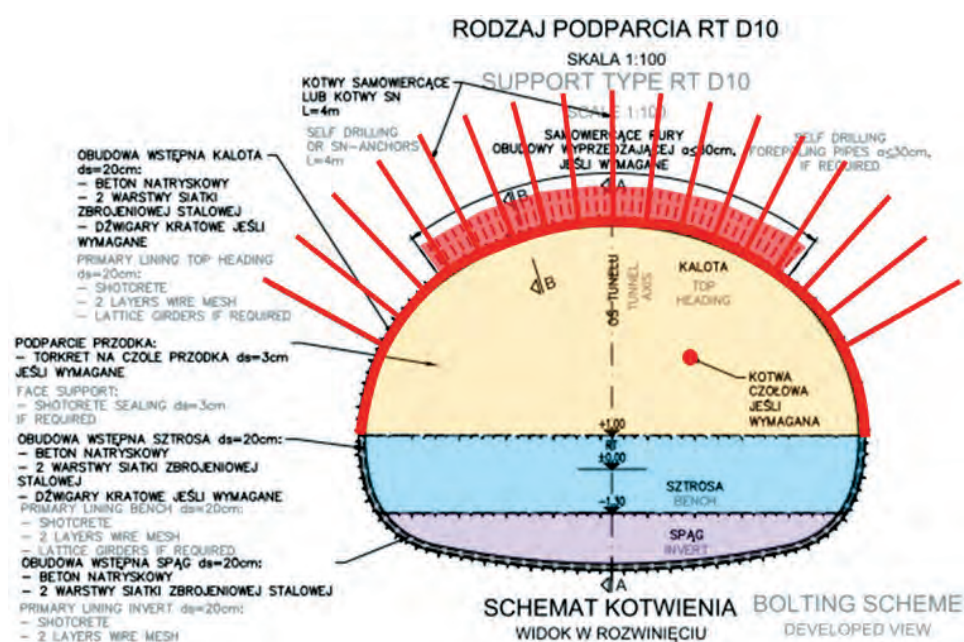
Support class D10, cross-section of pit division with elements of primary lining [3]
